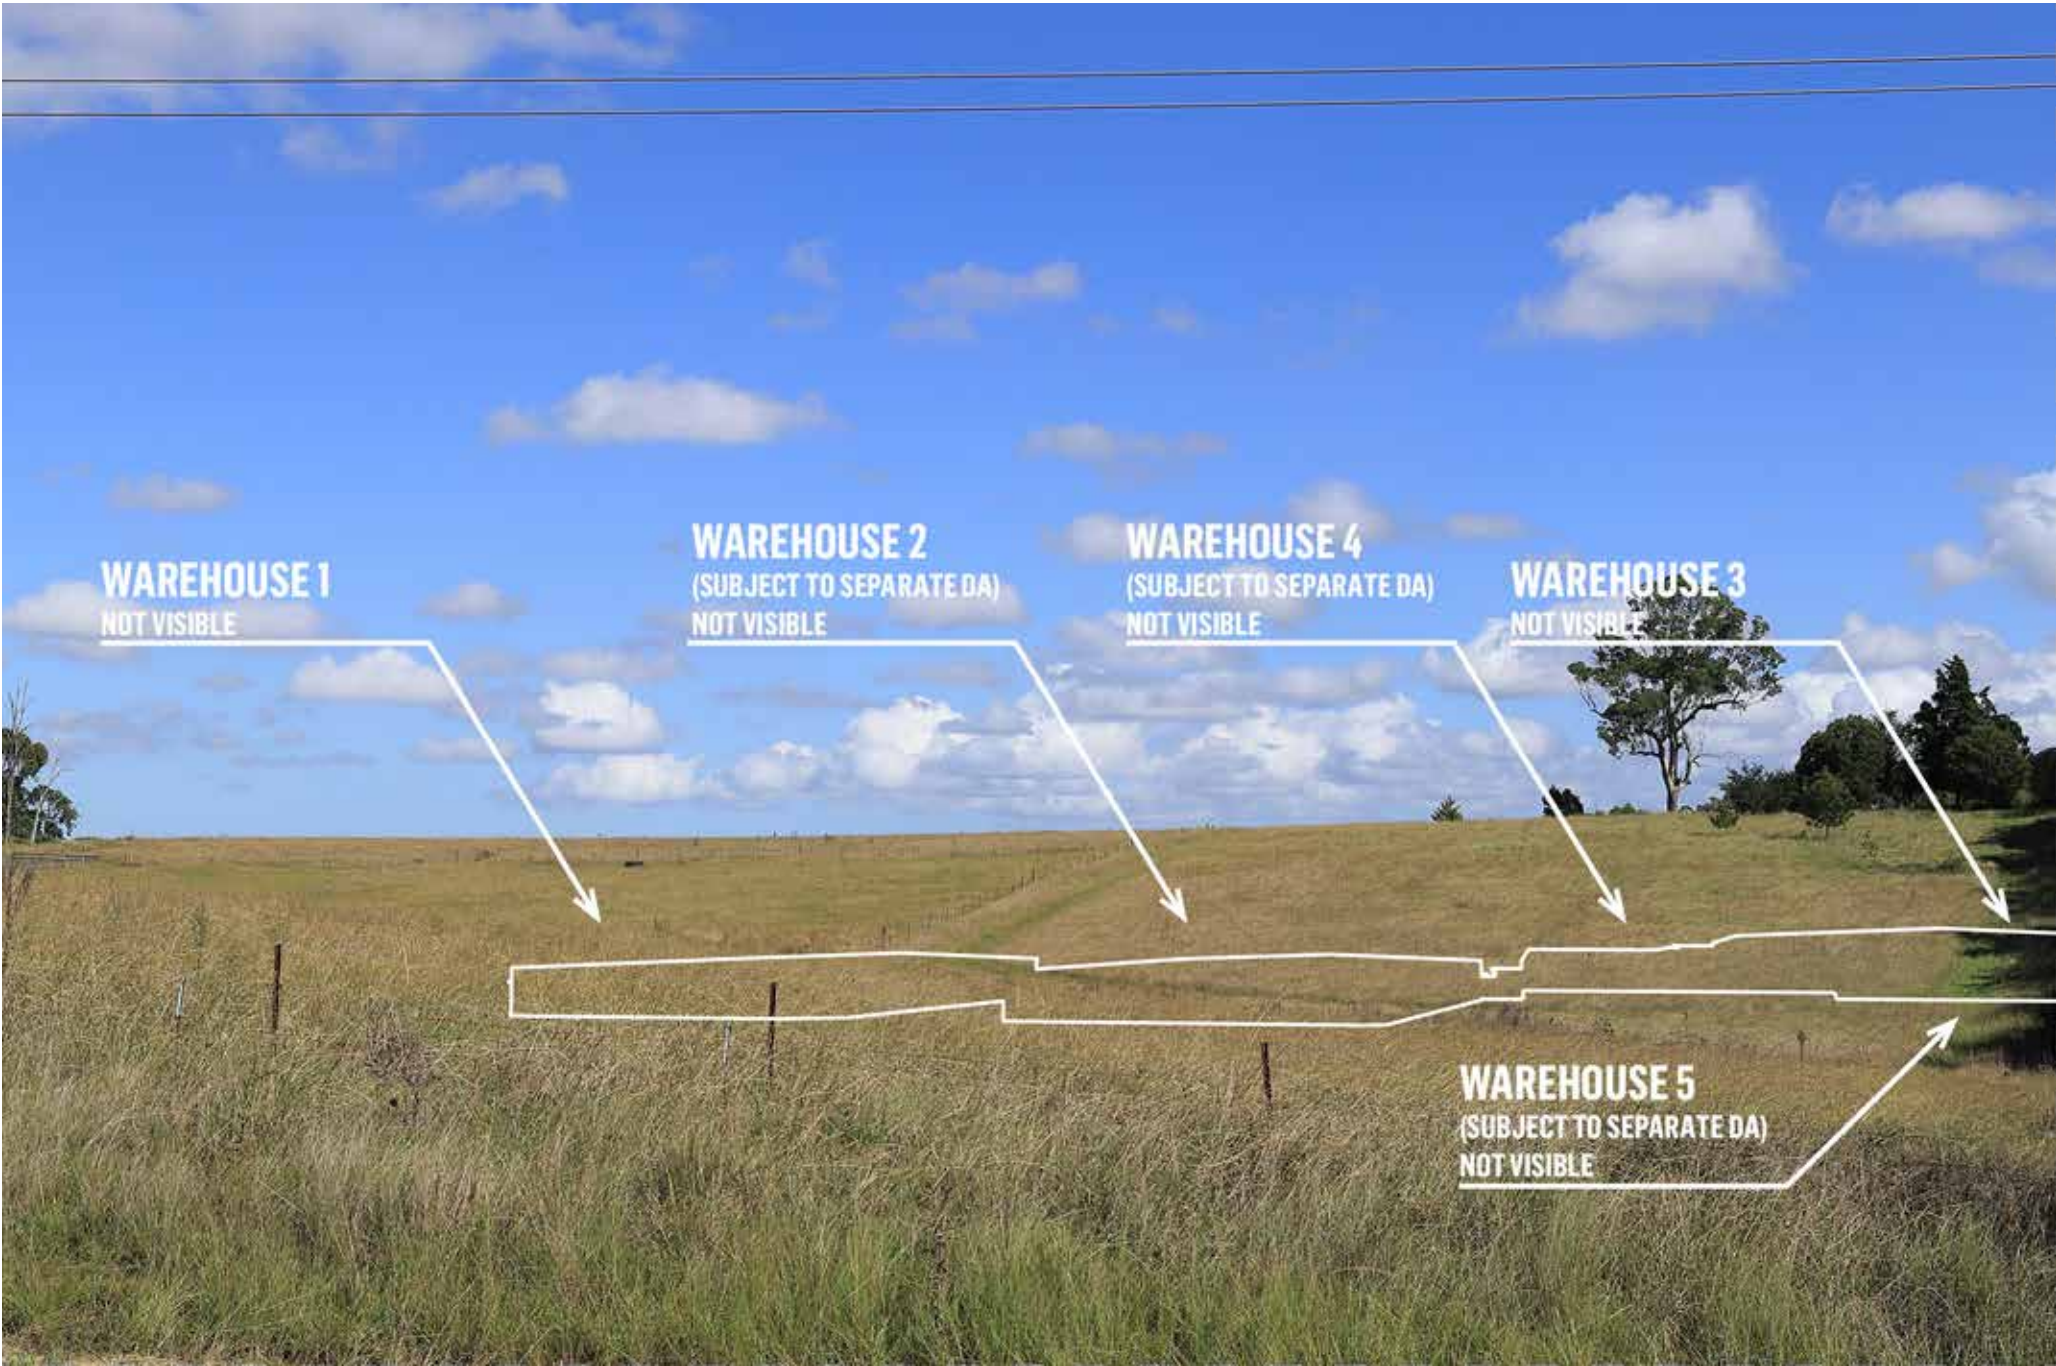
Existing view 4- View of the Rear of site from Aldington Avenue
